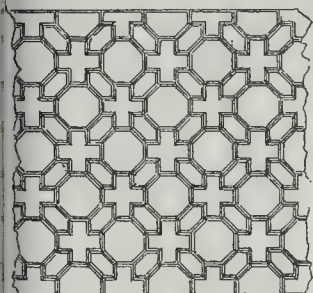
Ceiling, Long Gallery, Apethorpe.
